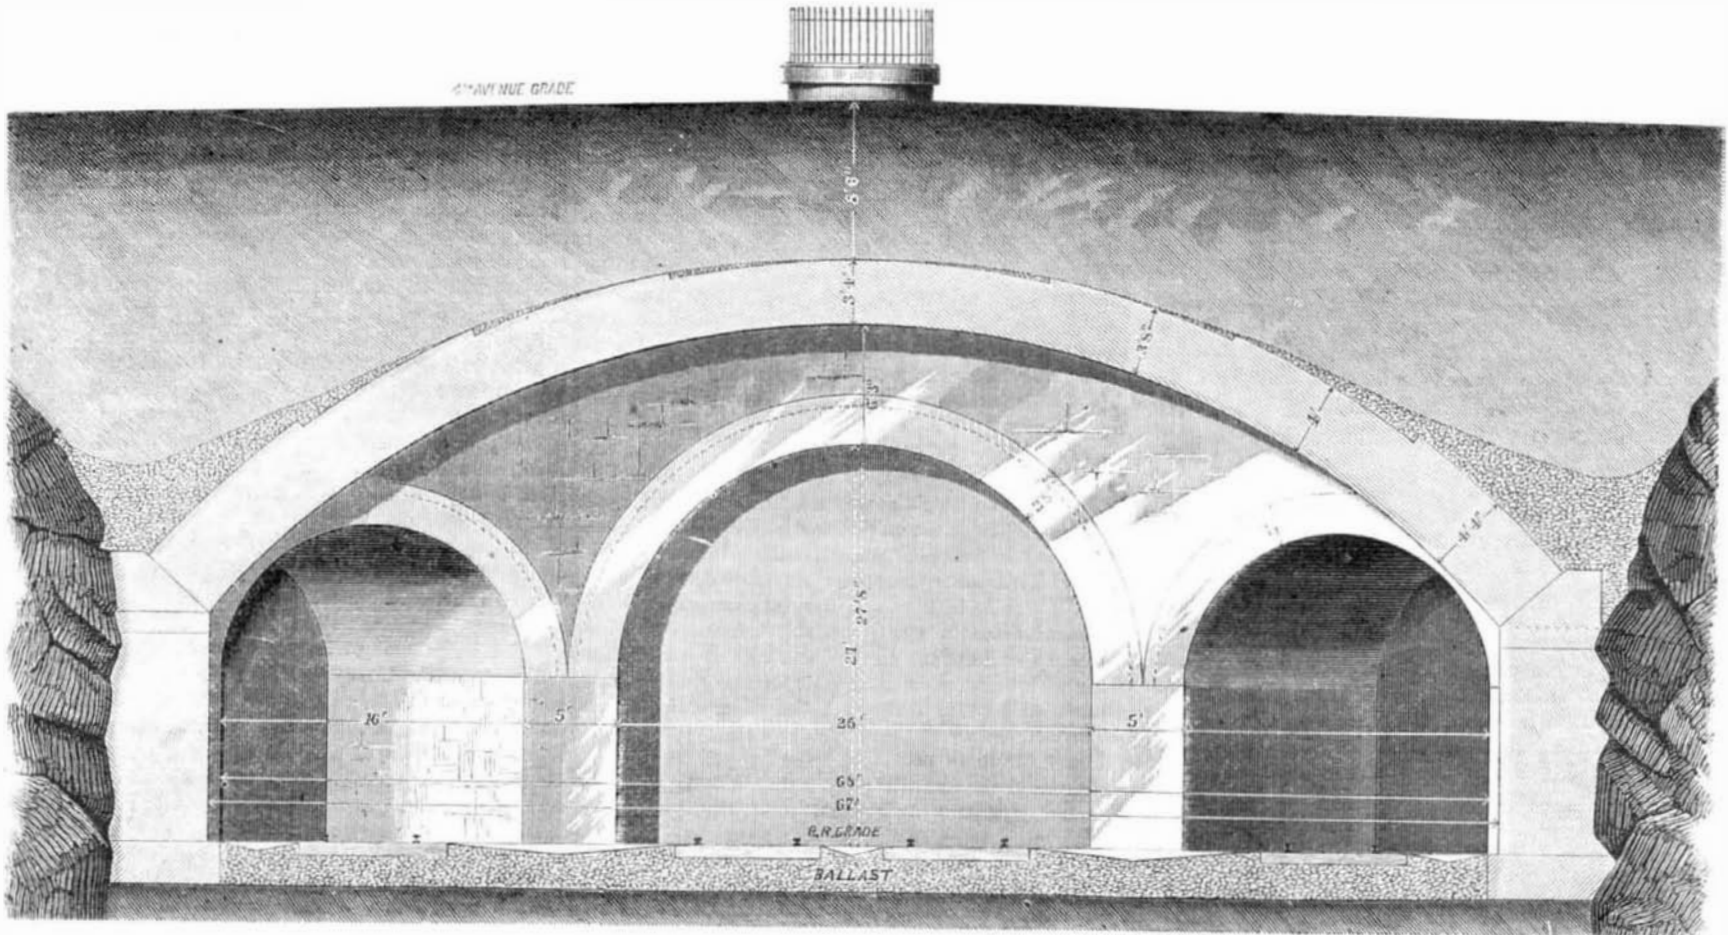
THE UNDERGROUND RAILWAY IN NEW YORK.—THE GREAT ARCH NEAR 95th STREET.
